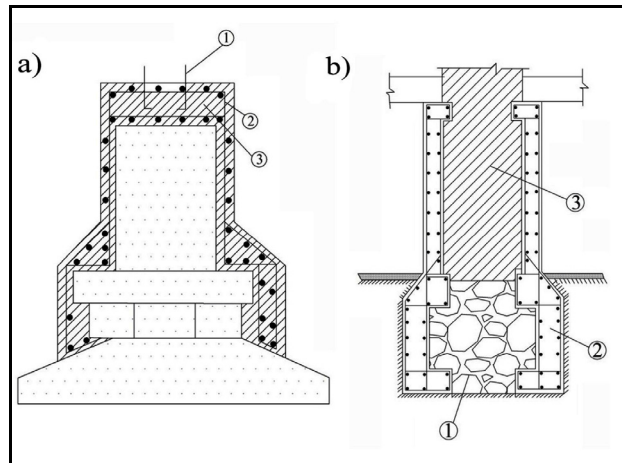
a) Method of strengthening precast foundation by a concrete jacket
